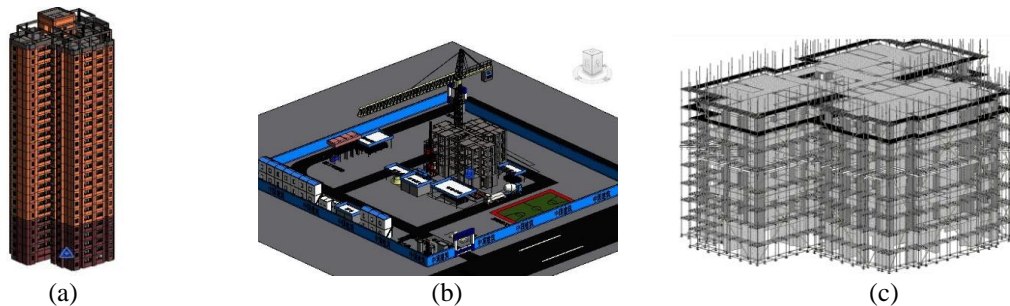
example (a)Example of 3D model (b)Example of site layout drawing (c)Example of temporary construction model
